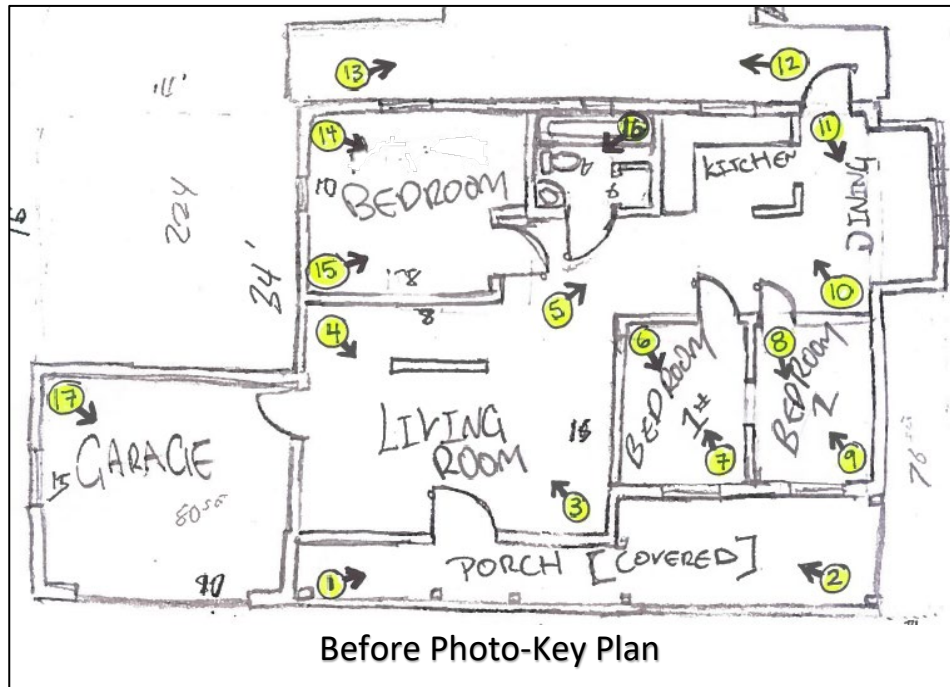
Hand-drawn plan example with Photo Key, original image courtesy of Damani Crichton, a high school student. Image sourced from: <https://sites.google.com/site/architecture2015edition2/home/drumheller/floor-plans-sketches>
